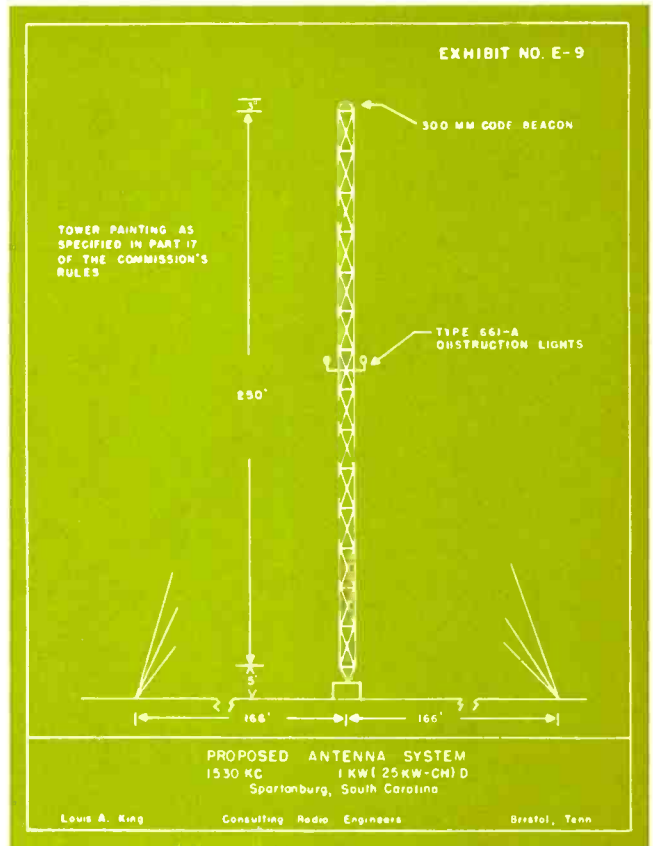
Example of vertical plan sketch requested in Section V-G.
